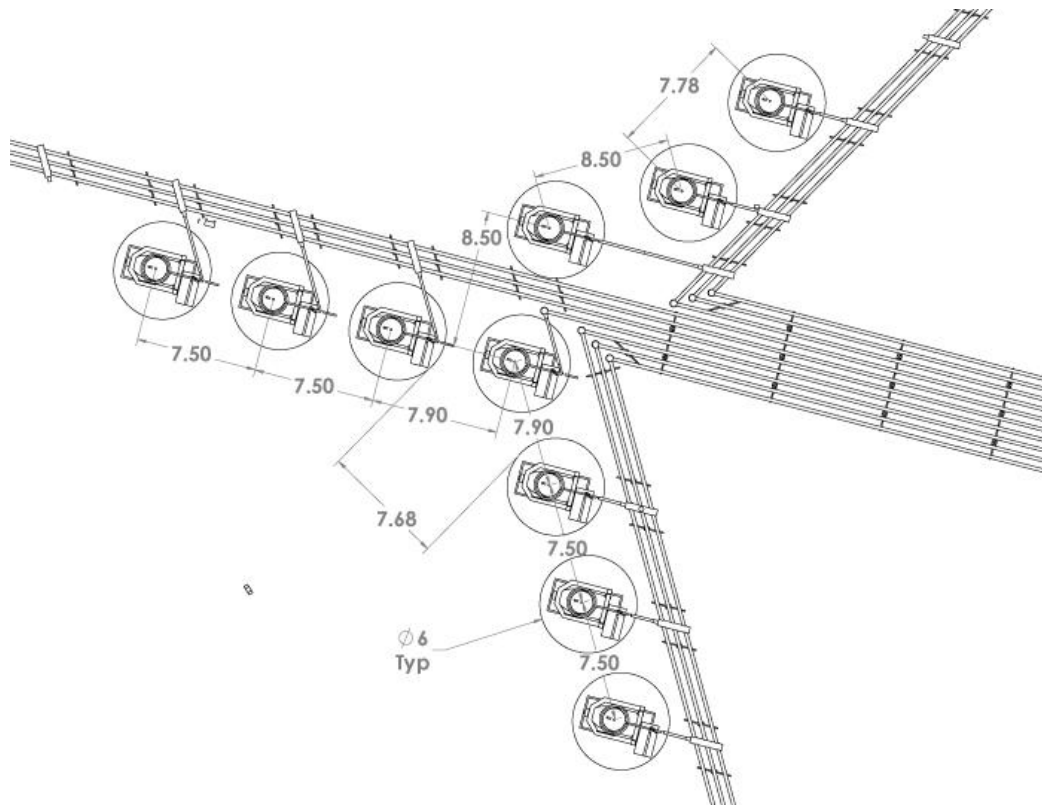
Plan view of the central part of the MROI array stations and infrastructure. North is to the top and East to the right. Note how the light beams from the telescopes exit the telescope enclosure walls (denoted by the circles surrounding each telescope) in two different directions depending on which arm of the array they are located on: telescopes on the Western arm have beams that exit towards the North, while telescopes on the Northern and Southern arms have beams that exit towards the East
